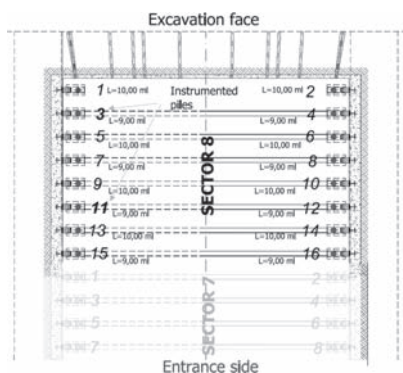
Plan of a typical sector (i.e. number 8 in Figure 1) with the installation lay-out of jacked piles (pile spacing 1 m).
